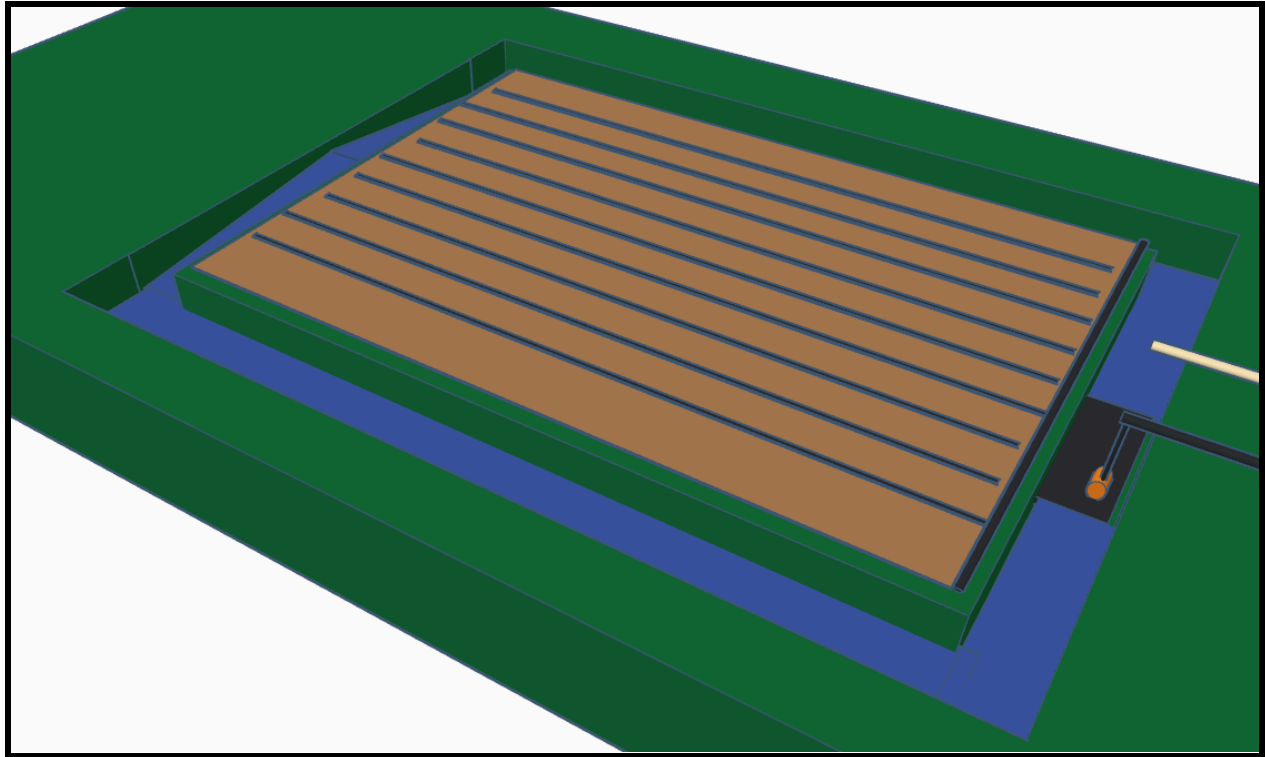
A view of the angled concrete ramped sections inside the moat, highlighted blue.
